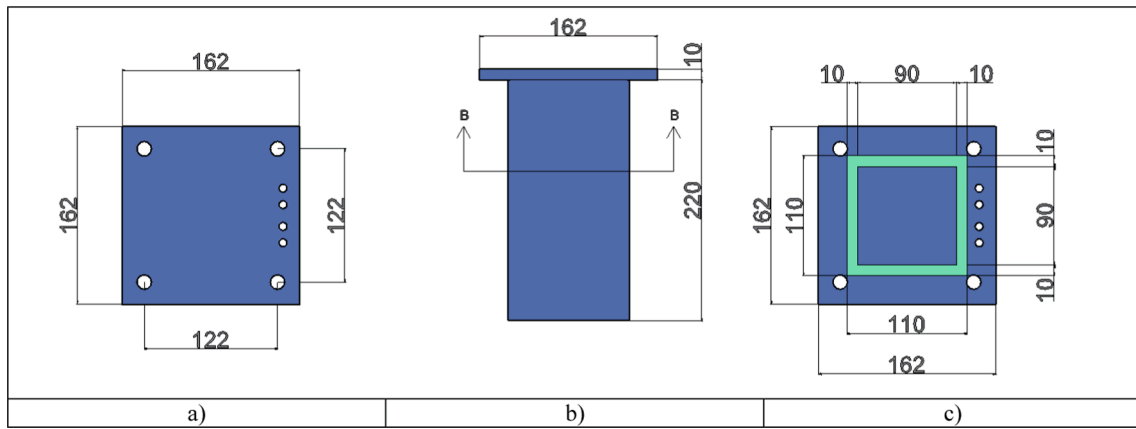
Steel socket for column bonded connection: a) upper plate, b) socket, c) transverse section (B-B).
